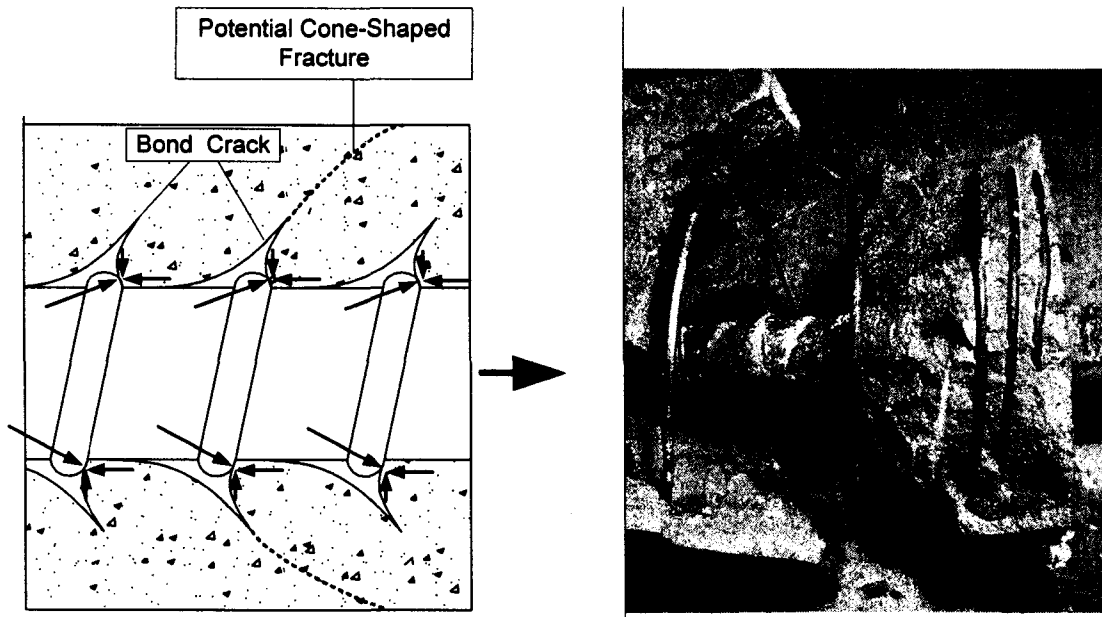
Cone-shaped fracture in transverse steel confined concrete
